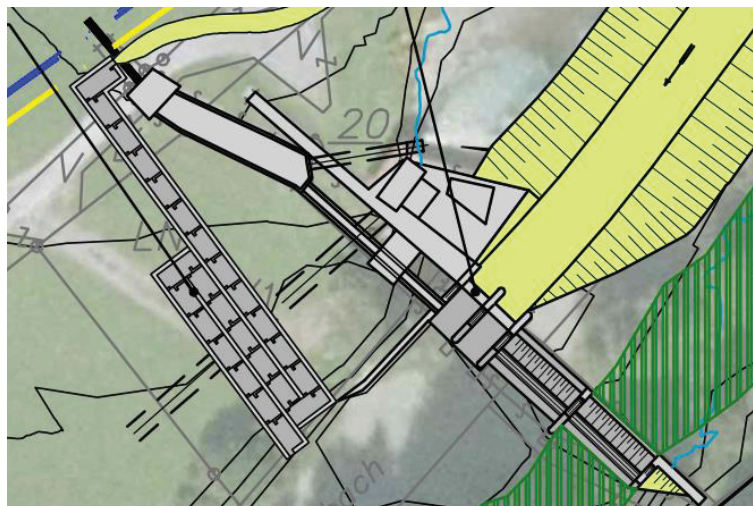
Plan view of existing weir and new fish passage. Flow from upper right to lower left.
